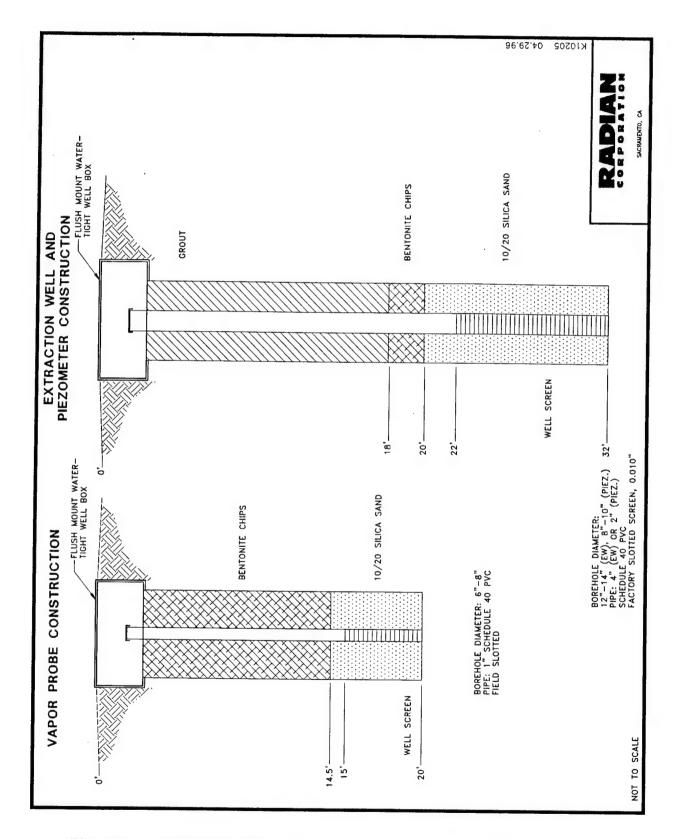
Extraction Well, Vapor Probe, and Groundwater Piezometer Construction Detail (Pride Hangar)
